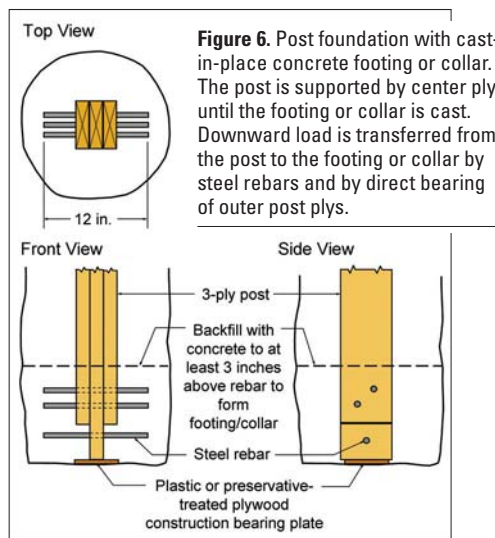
Post foundation with cast-in-place concrete footing or collar. The post is supported by center ply until the footing or collar is cast. Downward load is transferred from the post to the footing or collar by steel rebar and by direct bearing of outer post plys.
